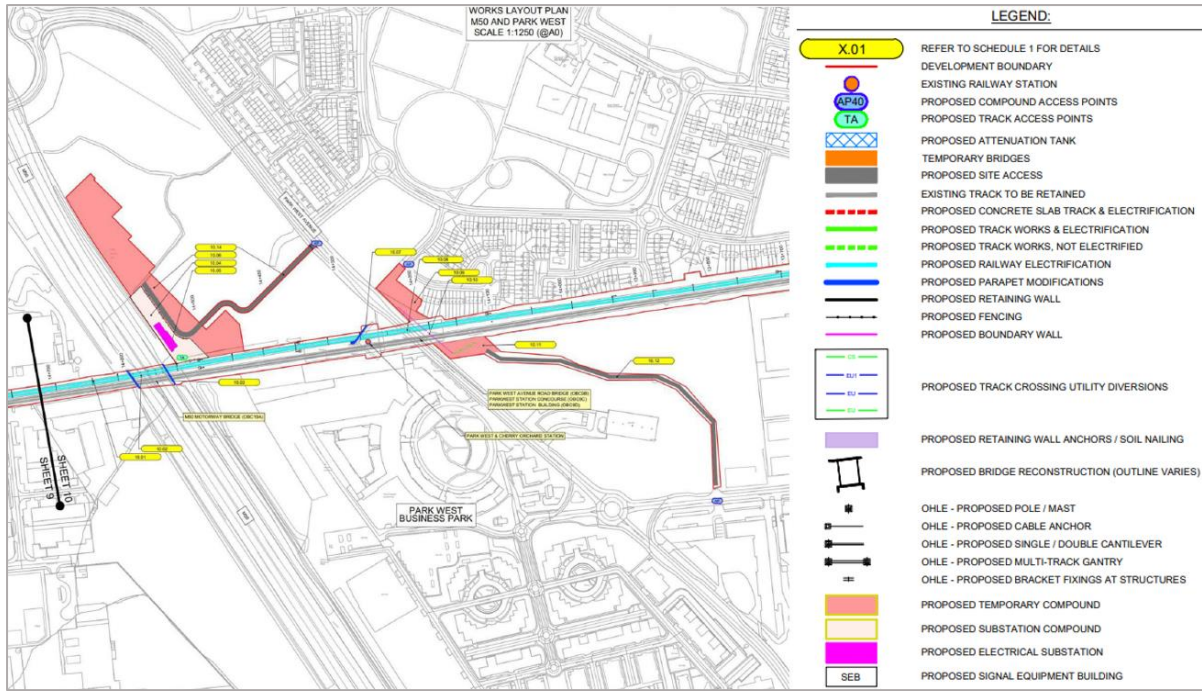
Proposed Works Layout Plan for the DART+ SW (Source: Layout Plan from DART+ SW Rail Order Application)
